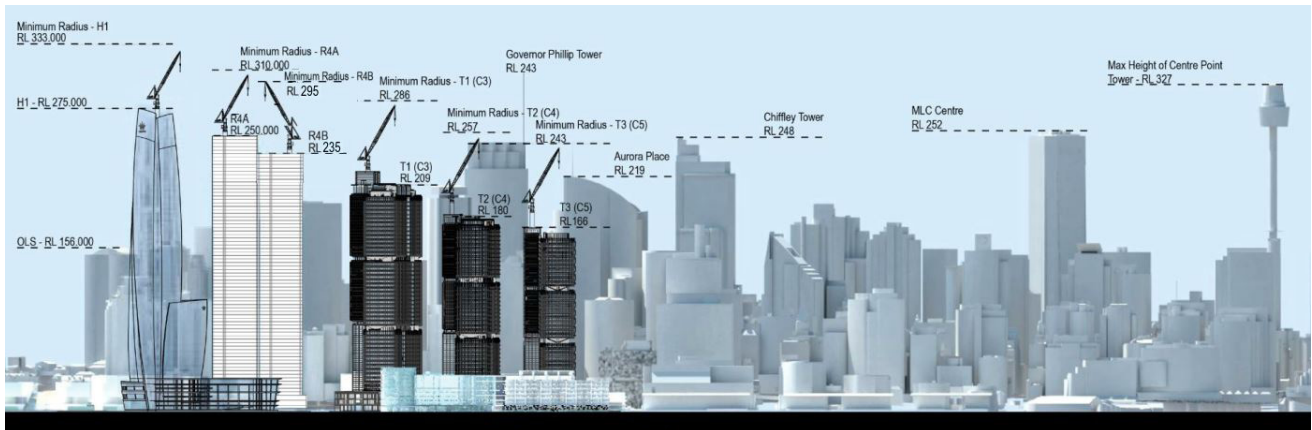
Maximum building and crane heights in relation to other existing and under construction buildings
